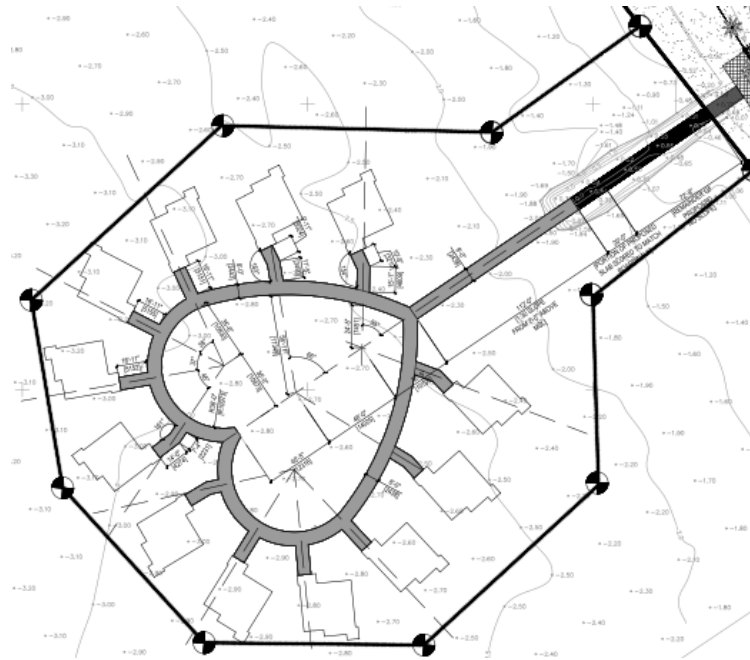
Showing the boardwalk and Overwater Rooms
